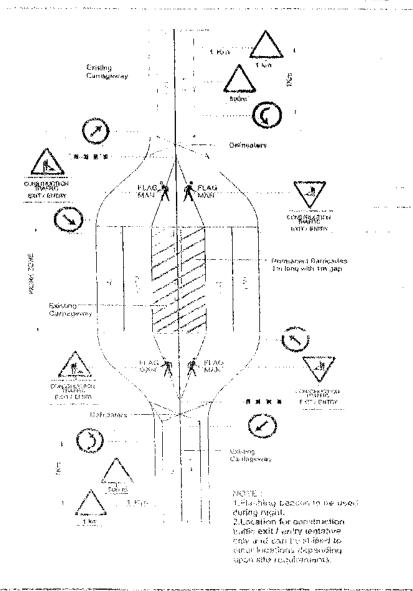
Layout of Traffic Control Devices For Urban Section (Stage-H) Construction of 4 Lane Divided Carriageway.
